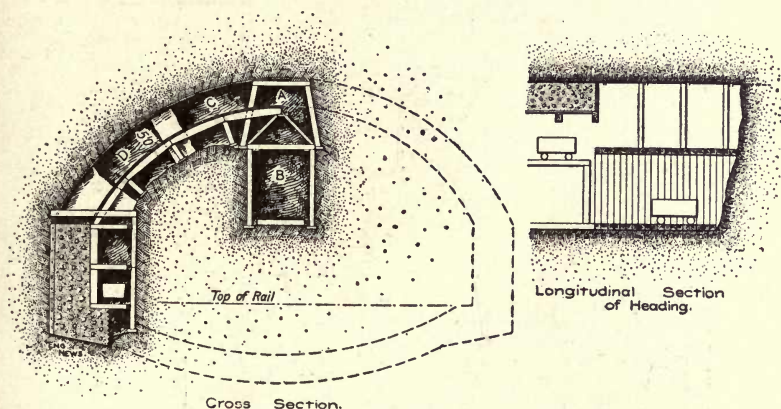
East Boston Tunnel; Atlantic Avenue Station: Method of Building Roof-arch.
